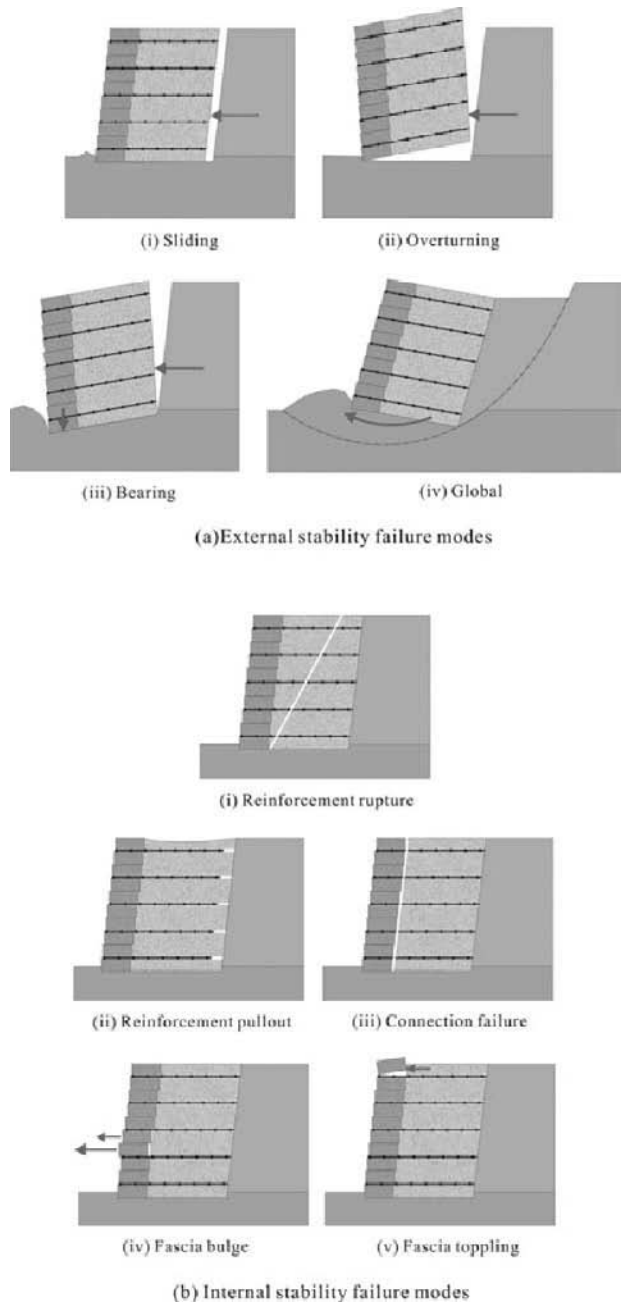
Possible failure modes evaluated in the design of geogrid reinforced segmental retaining wall
